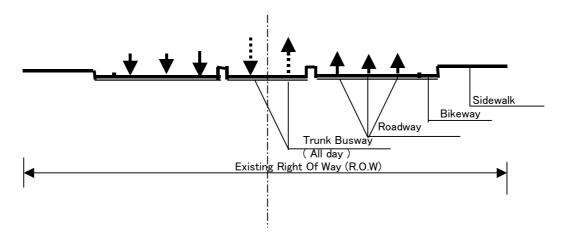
Typical Cross Section Location of Trunk Busway
